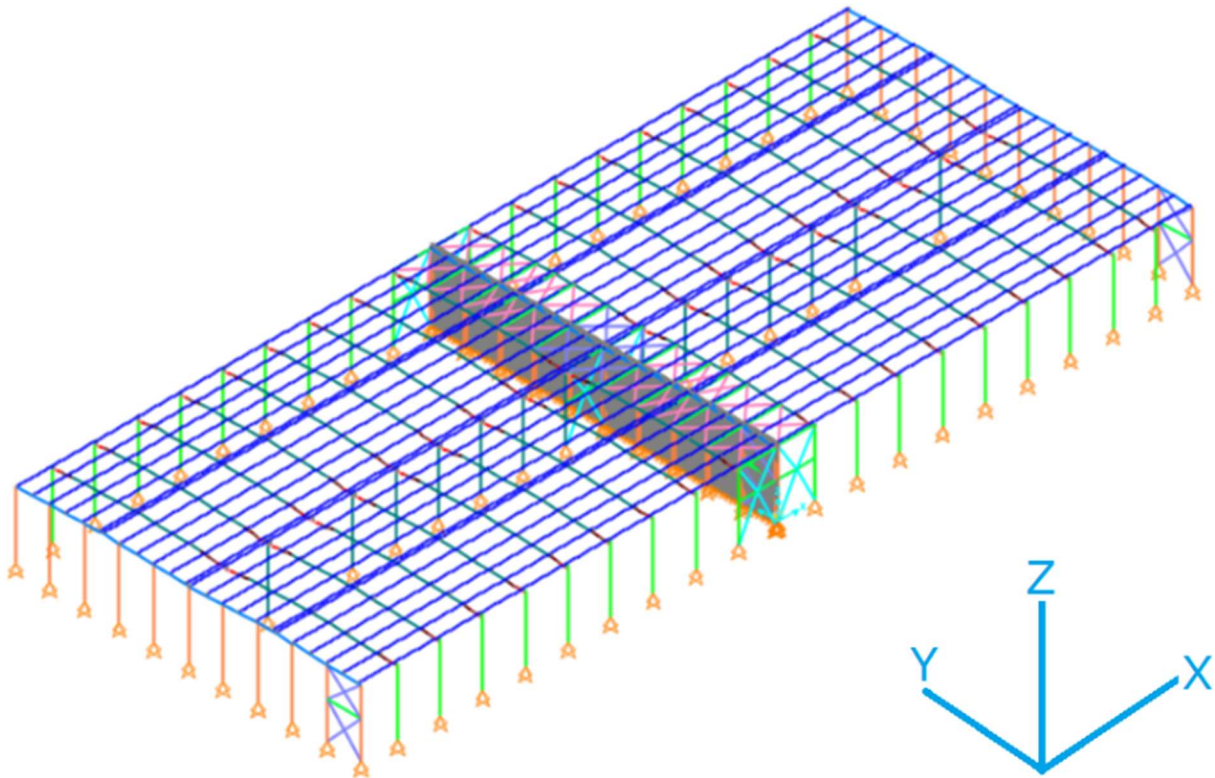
Fire wall parallel to portal frames with bracing system close to it
